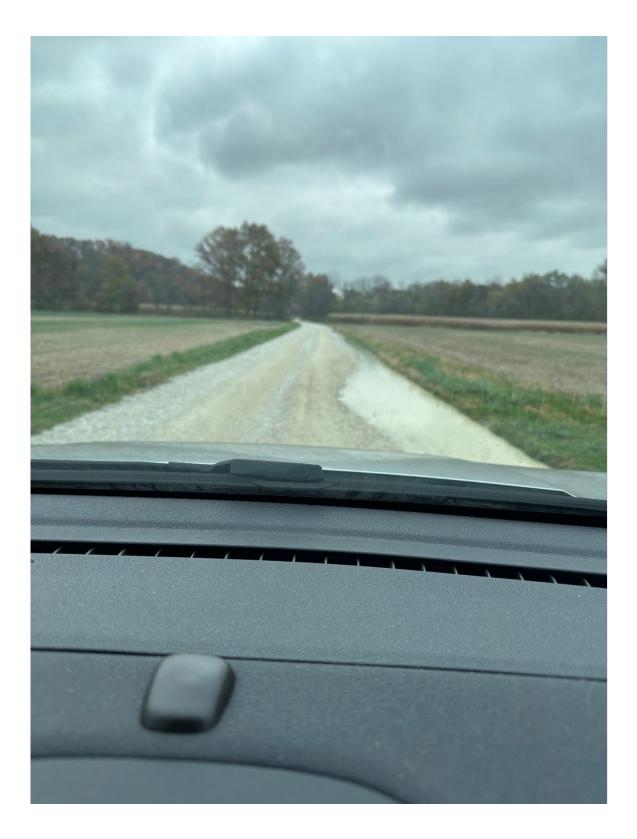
Traveling north along N Maple Grove Road from W Delap Road
